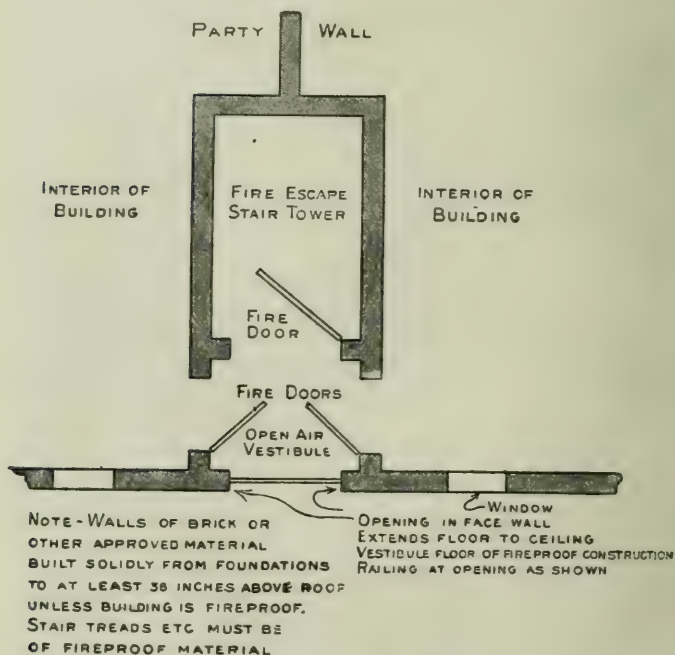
Fire Escape Stair Tower with Open-Air Vestibule Entrance.
